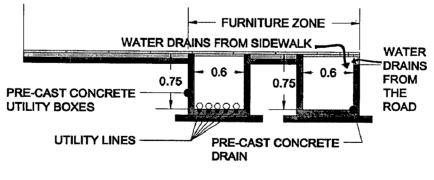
Detail of utilities planned under the furniture zone Source: By Author
